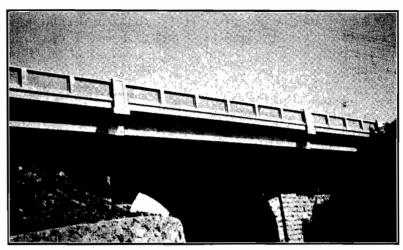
Showing bridge on the Main Heidelberg Road after completion of widening.
